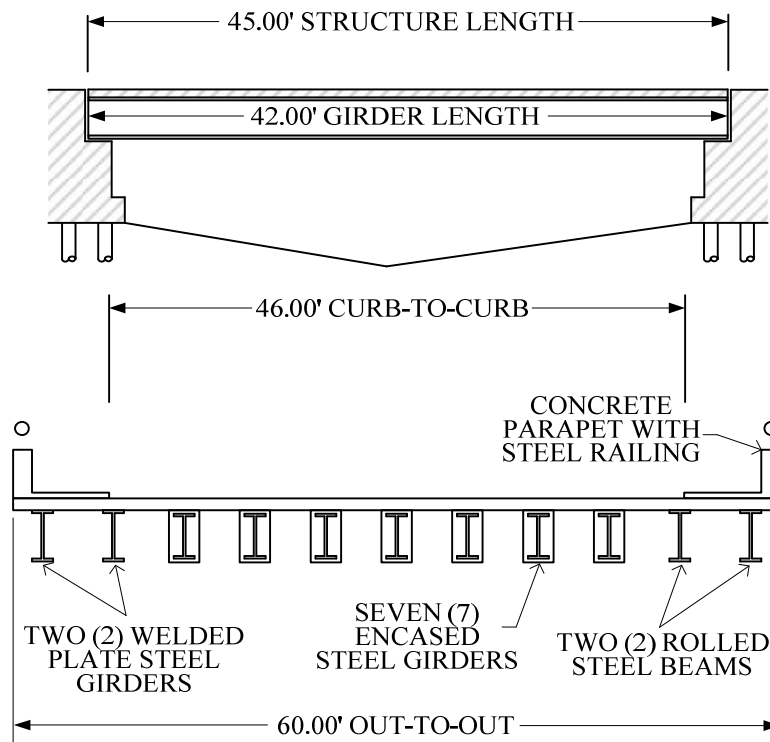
Elevation and Deck Cross Section of Single Span Steel Multi-Girder Bridge Example
